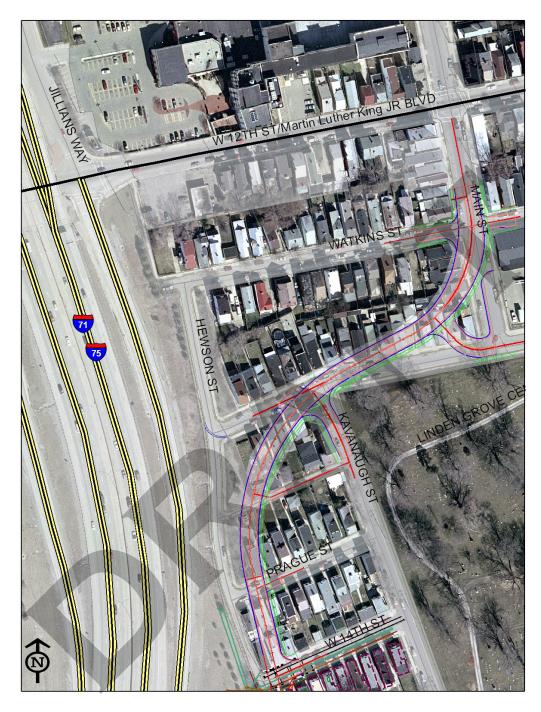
Configuration of proposed access road from 12th Street to St. Elizabeth Medical Center
